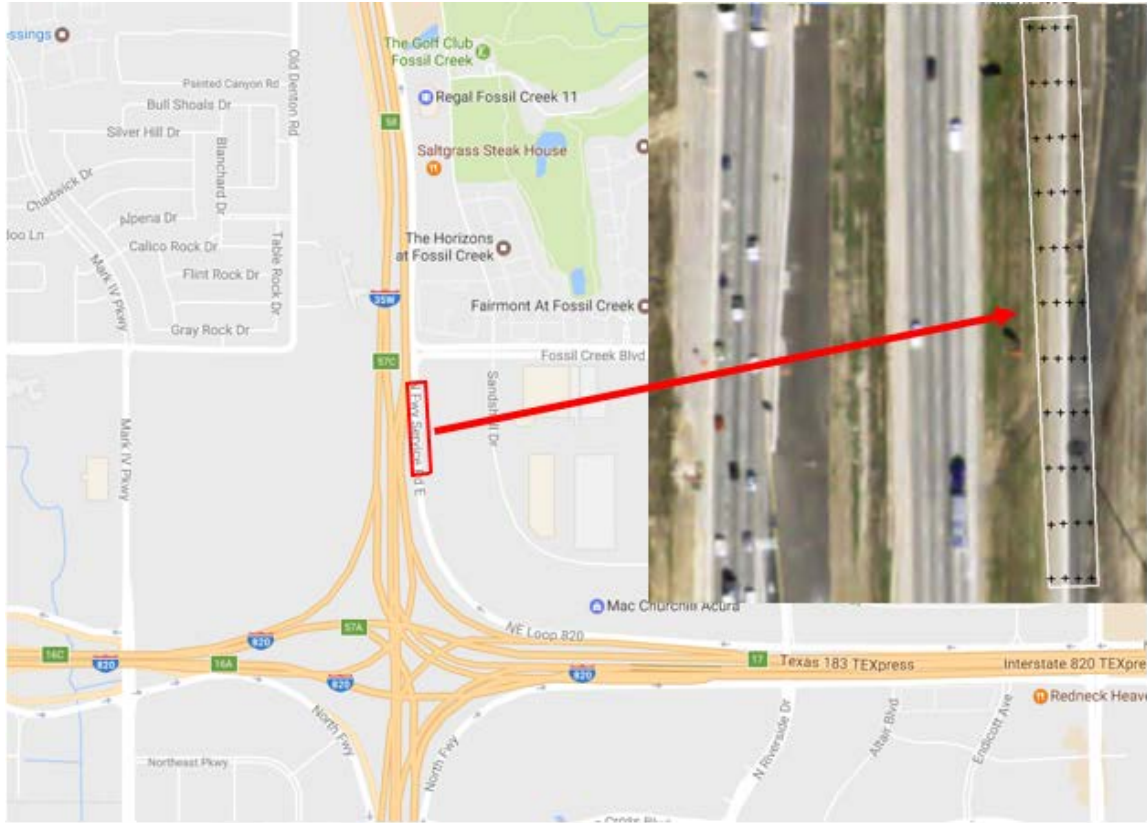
Location of Test Site on I-35W in Fort Worth, TX.
